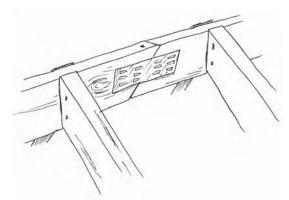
Joining of a ridge beam with 45-degree angle cuts and nail plates
